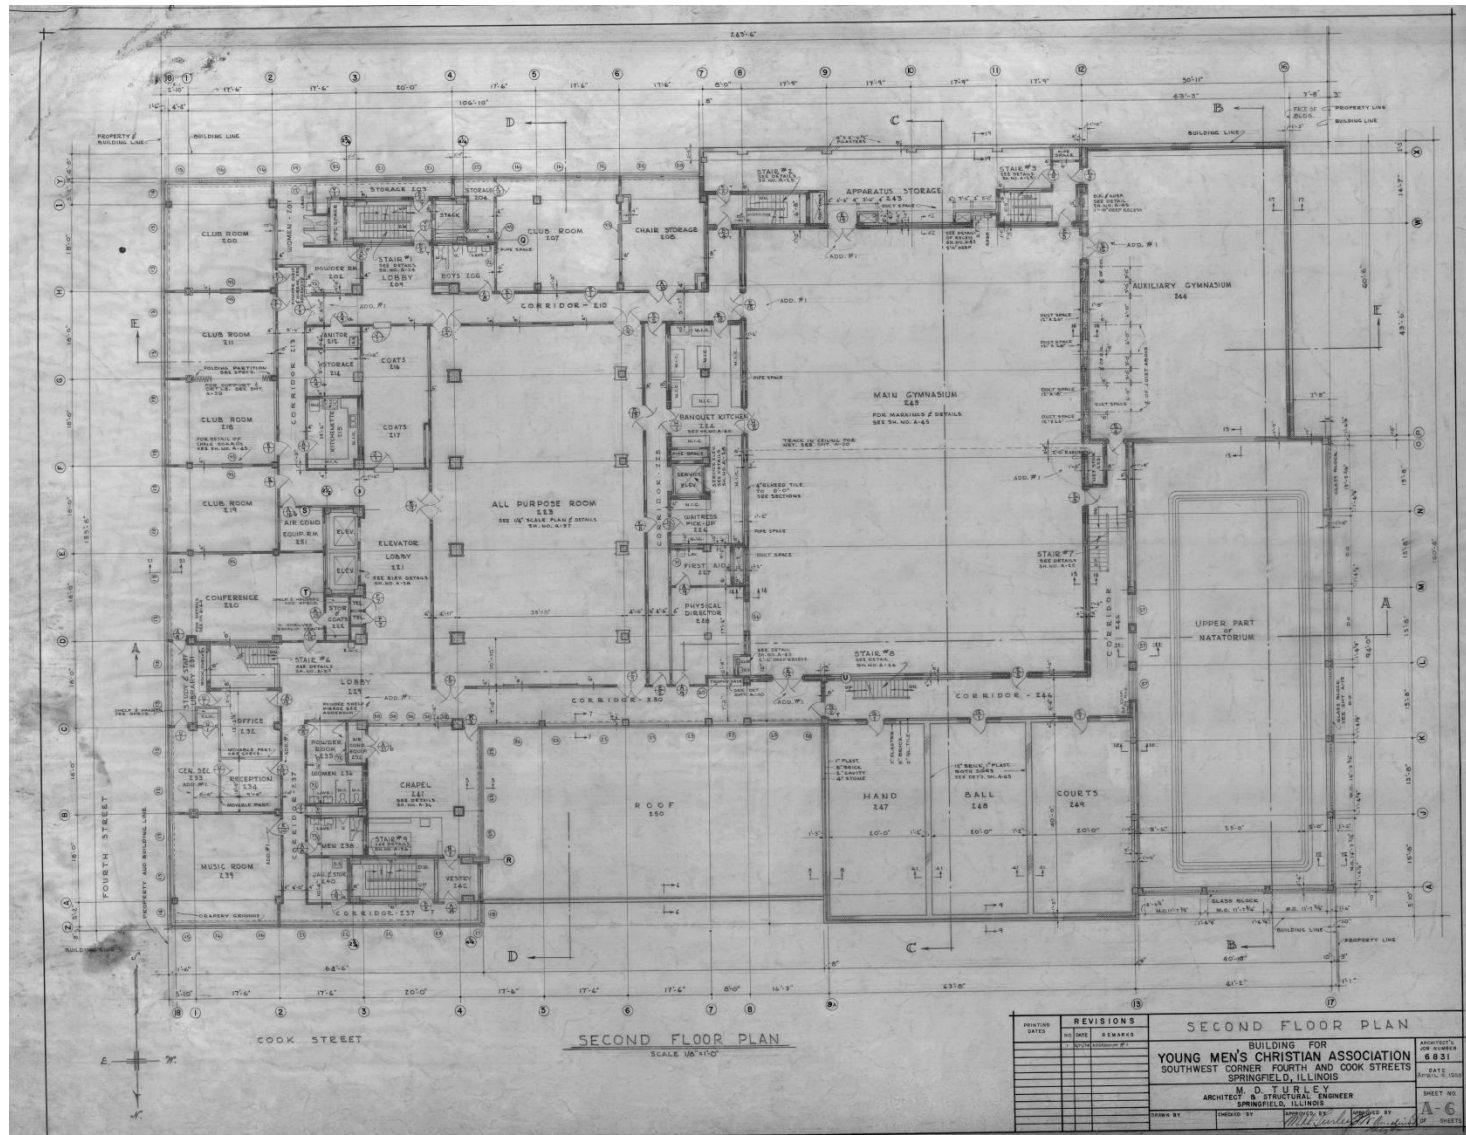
Second Floor Plan, Building for Young Men's Christian Association (Turley 1958: Sheet No. A-6).
